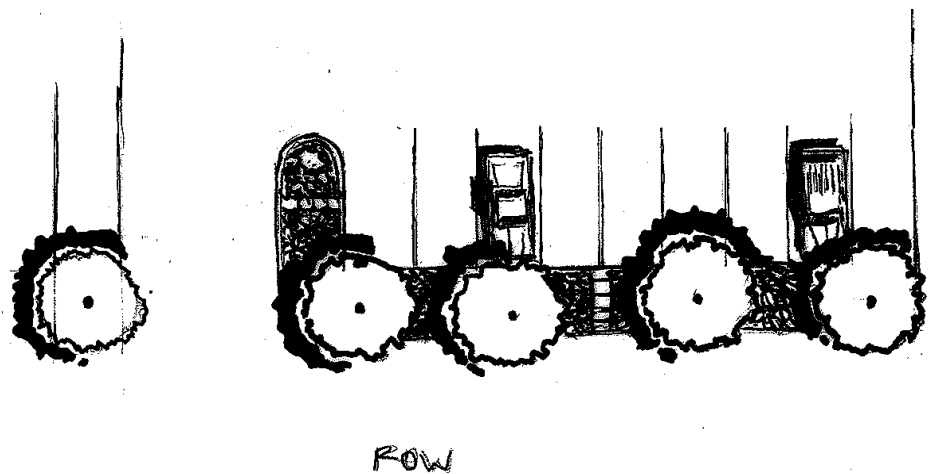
Parking Lot Landscaped Strip, Option 1
